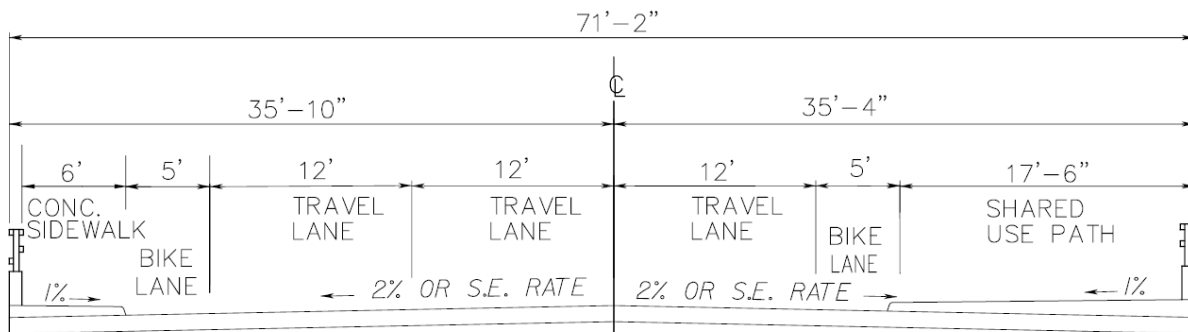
Typical bridge section for the recommended Hybrid Alternative.
